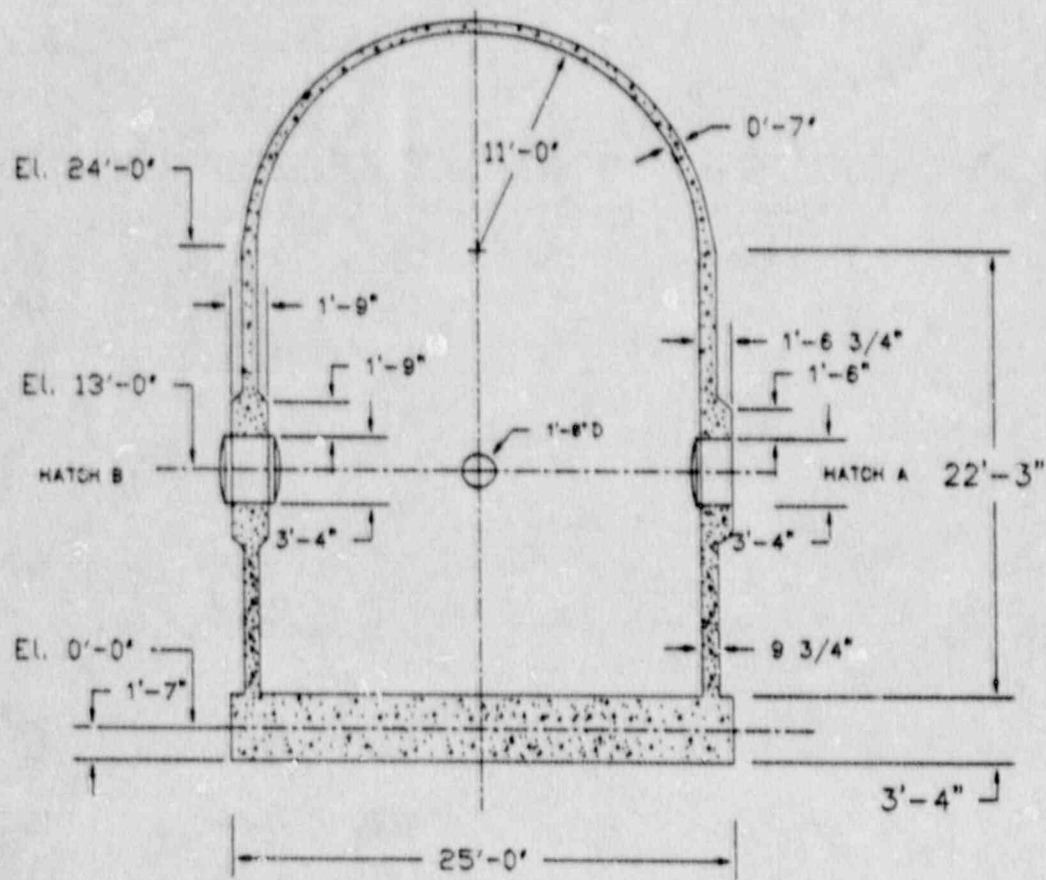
Section of Reinforced Concrete Test Structure
